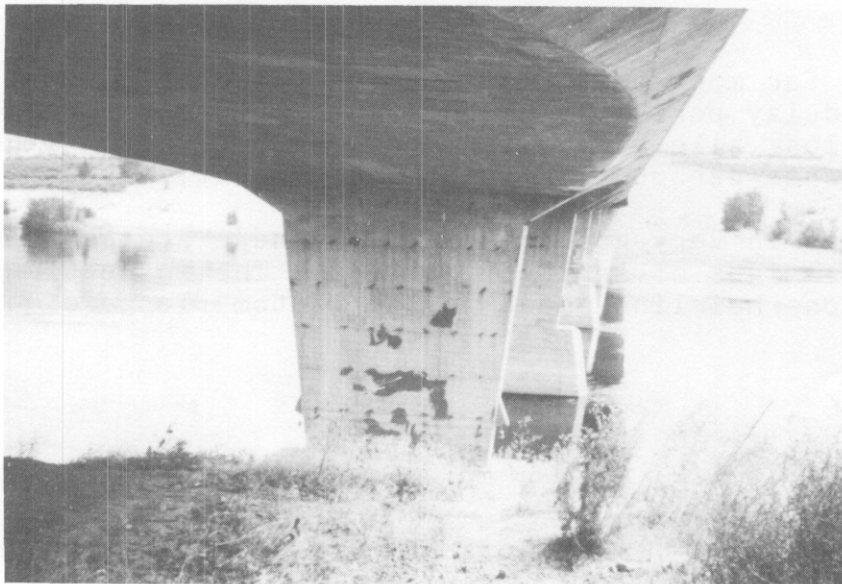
Underside of Concrete Box Girder and Piers of Columbia River Bridge
